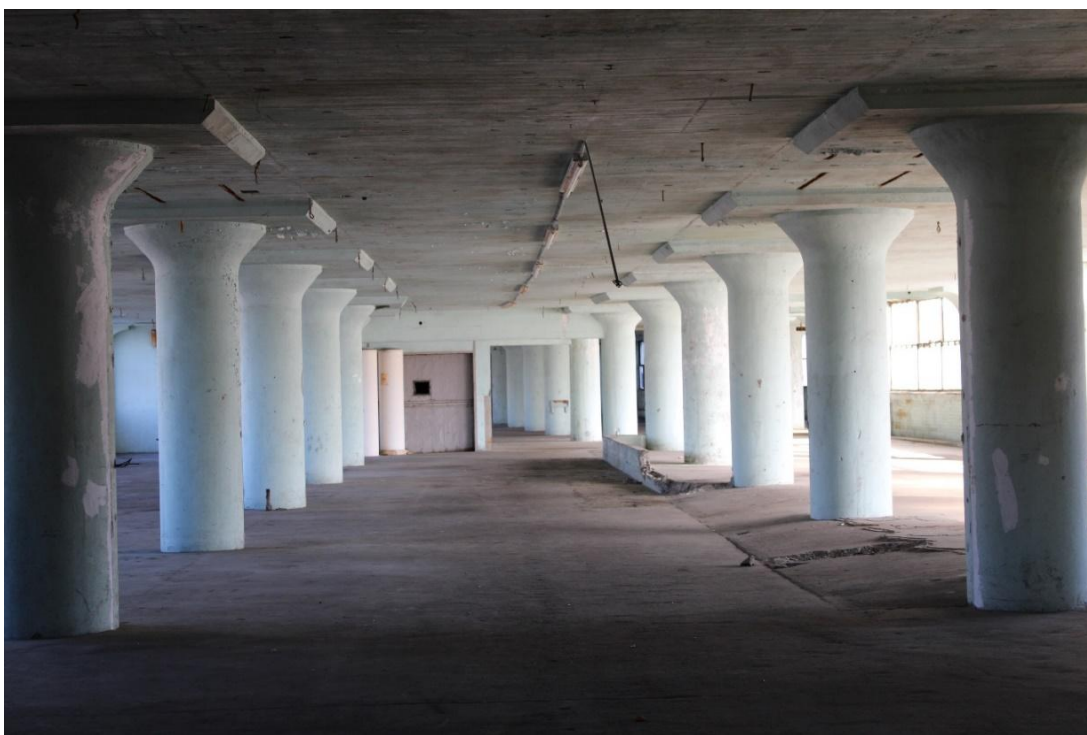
Interior of the Loft Building (building 30/31/32). Photo showing the interior of the second floor, looking south.
